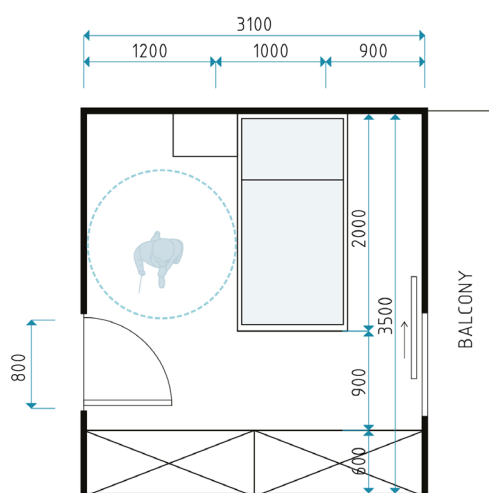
Illustrative floor plan of an accessible bedroom with a single bed (Lacho, Suláková)
